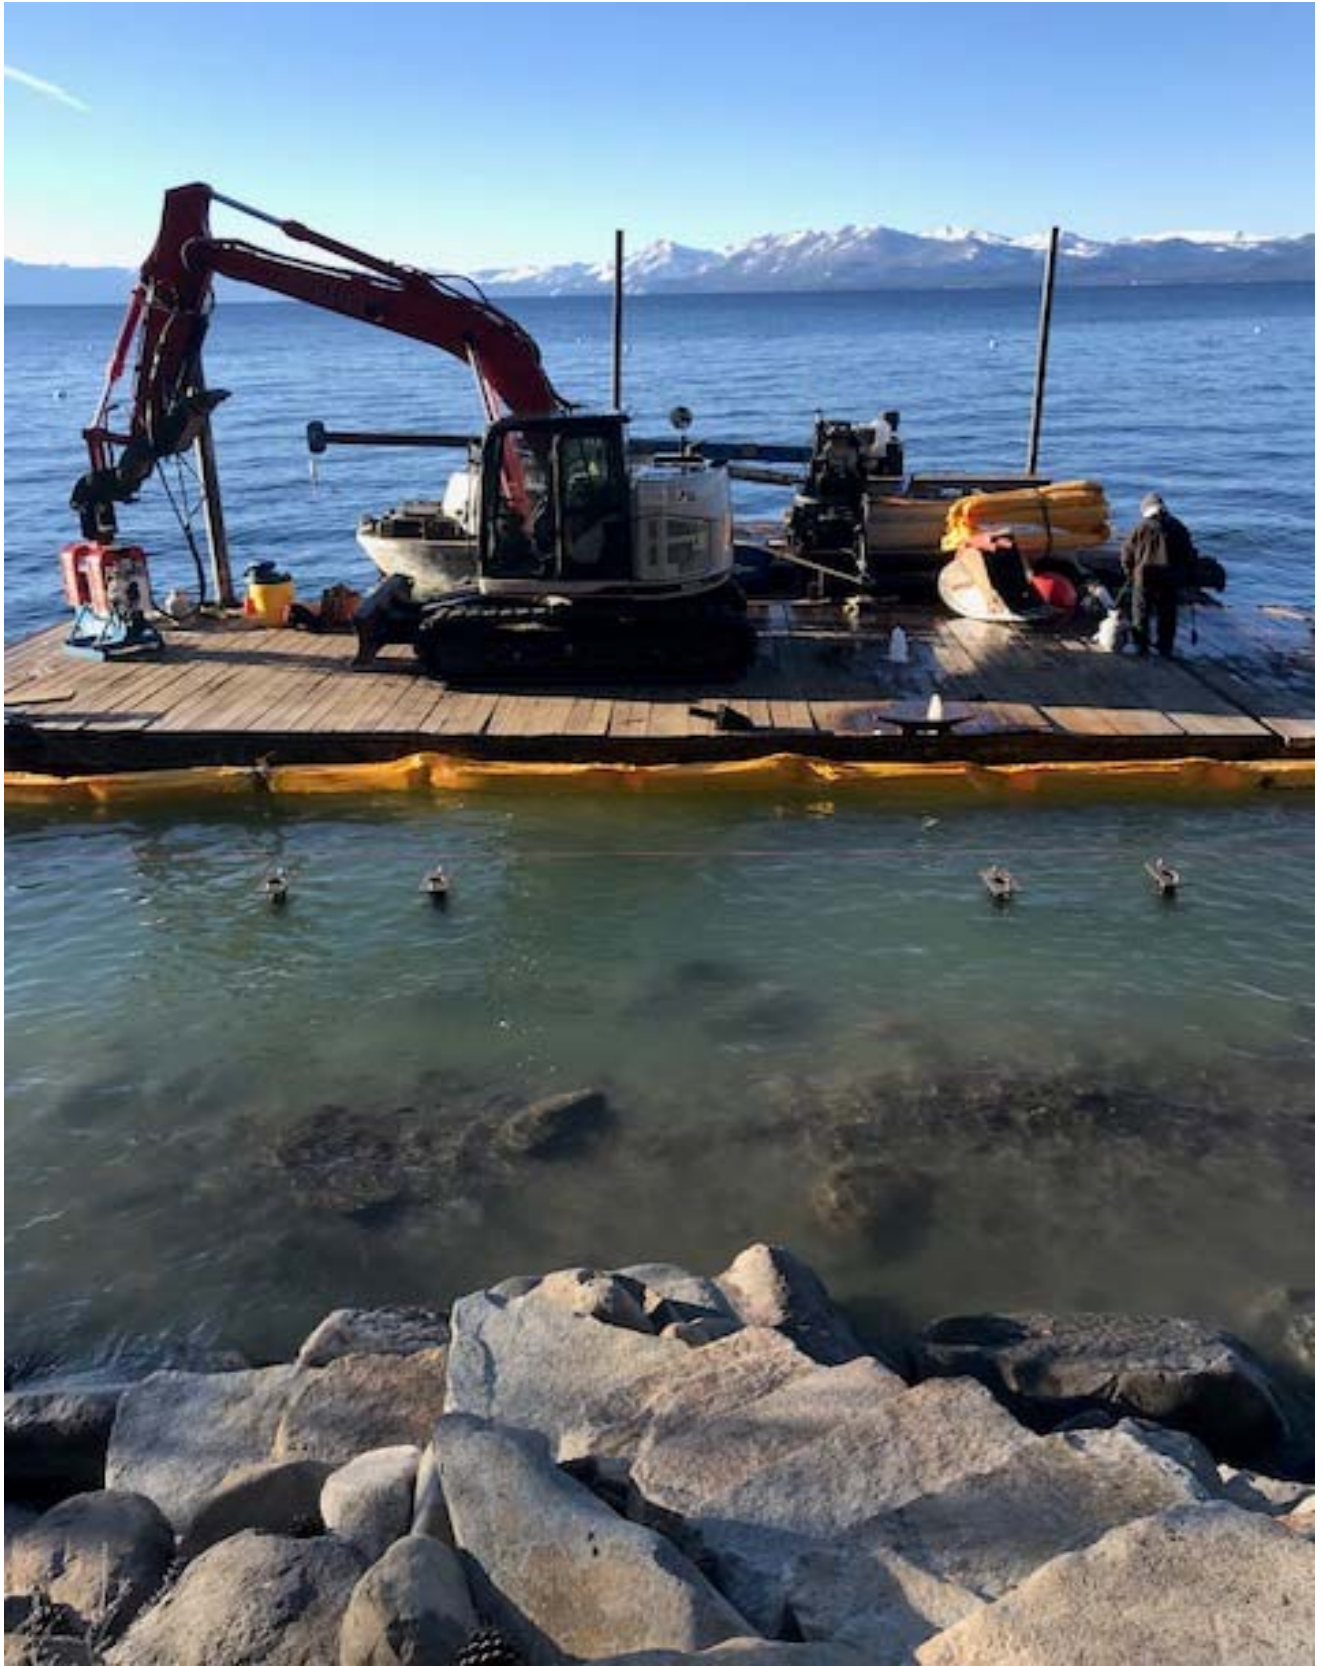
Trench excavated and anchor/support piles partially driven (photo taken Mar. 14, 2019 am)
